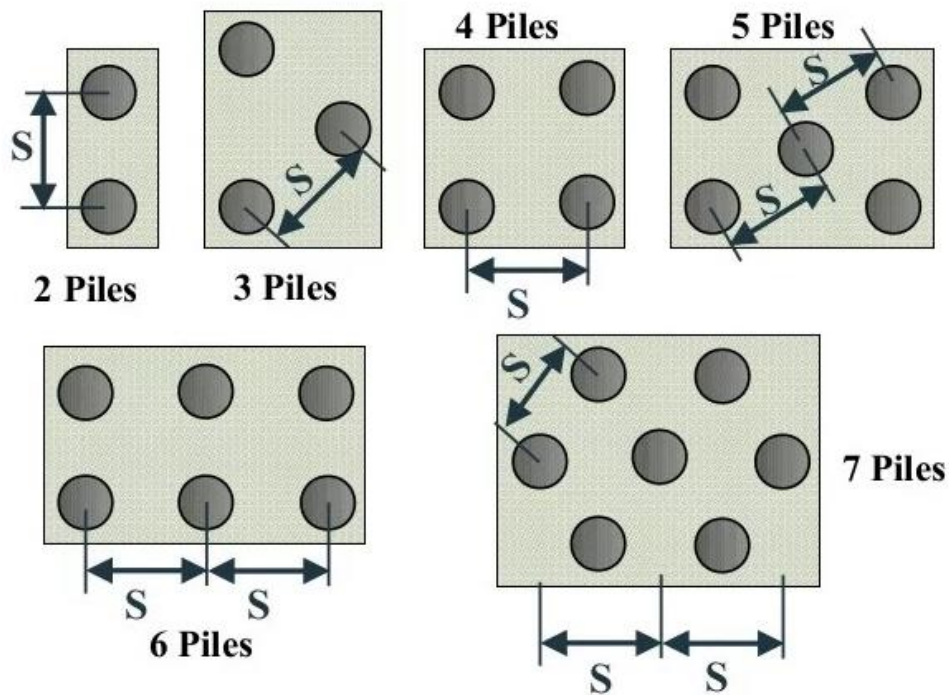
Different Pile Spacing (Ranjan and Rao)
